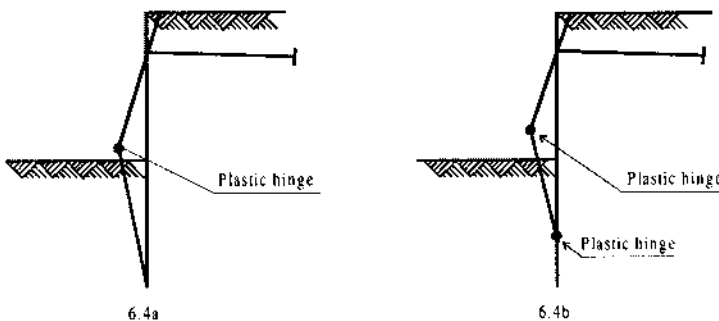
Structural failure in the flexible retaining wall. 6.4a. For a free earth supported wall, a plastic hinge in the 'field'. 6.4b. for a fixed earth supported wall, failure by two plastic hinges.
